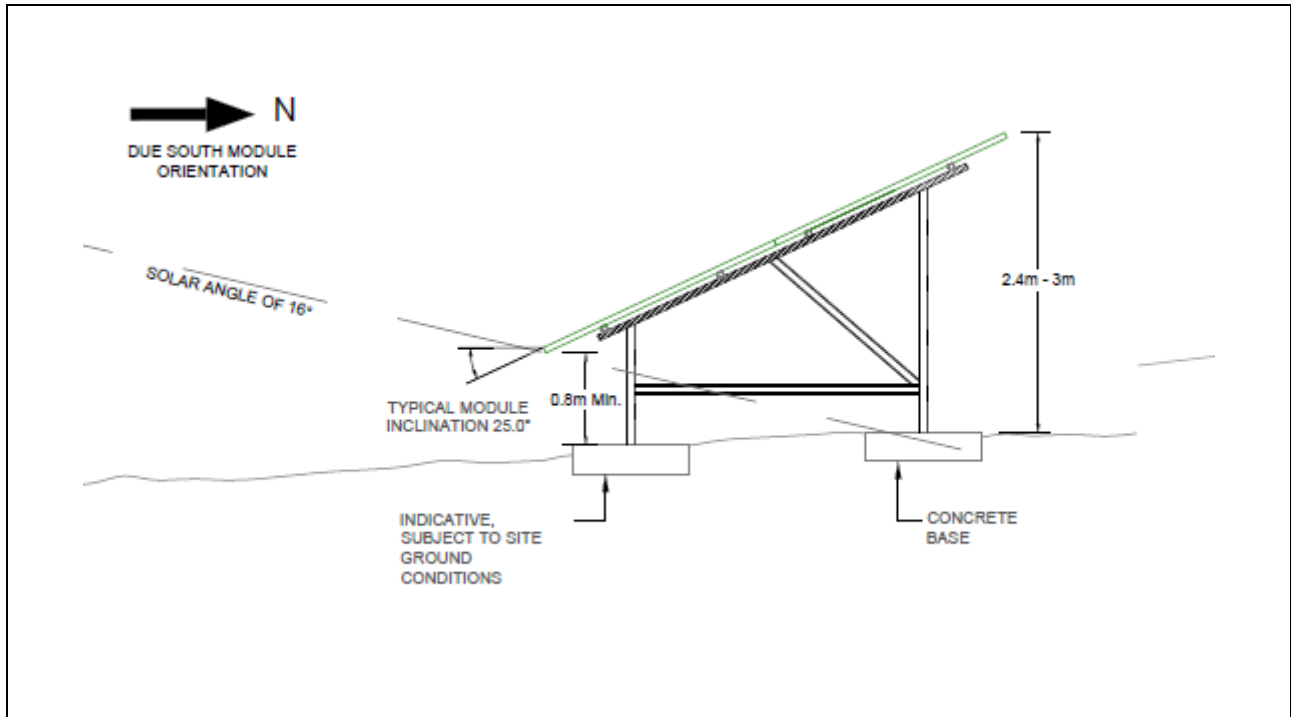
Typical Cross Section - Shallow Concrete Base Mounting System
